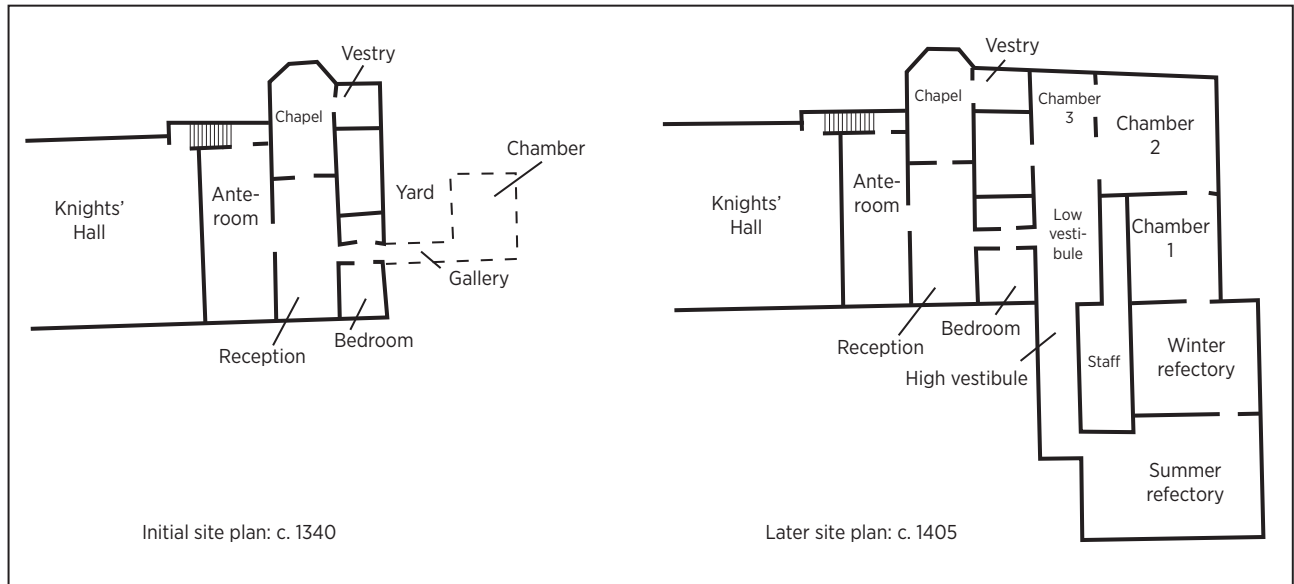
Malbork Castle: development plan of Grand Master's Palace
